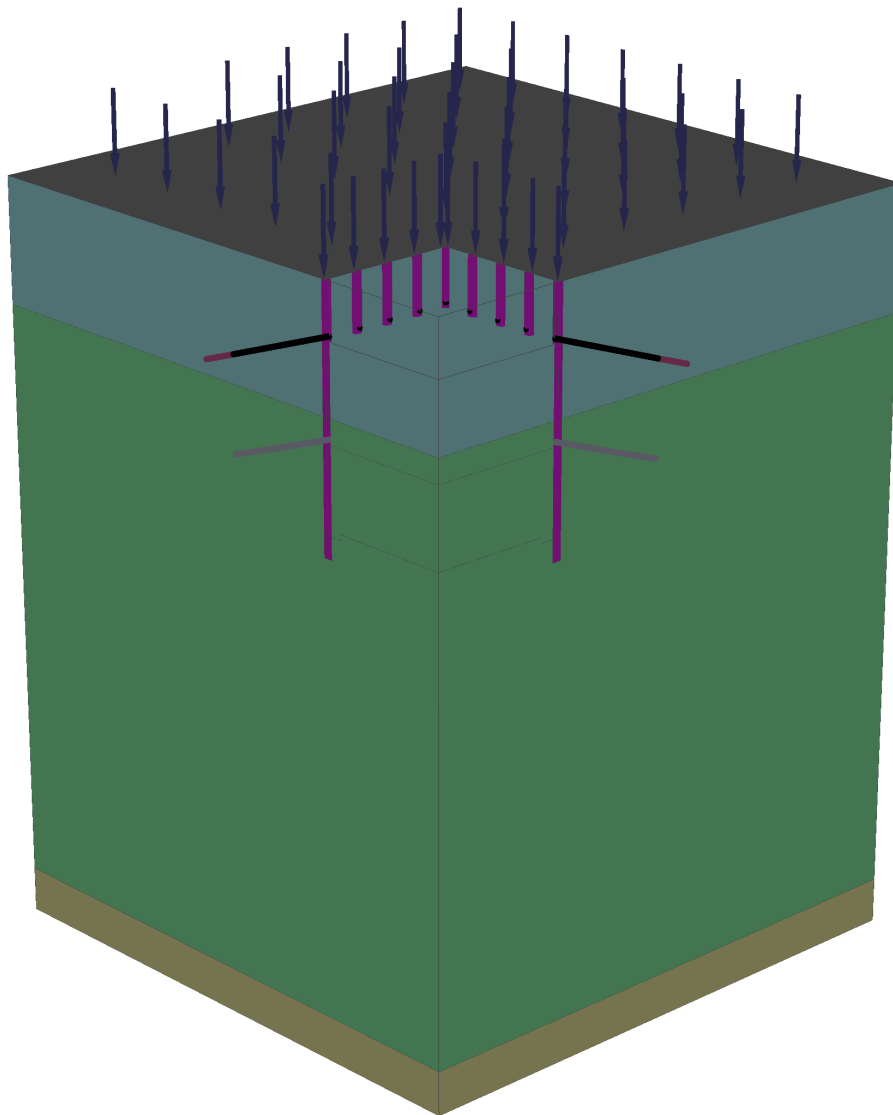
Stage 5: Installation and pre-stressing of the first anchor line.
